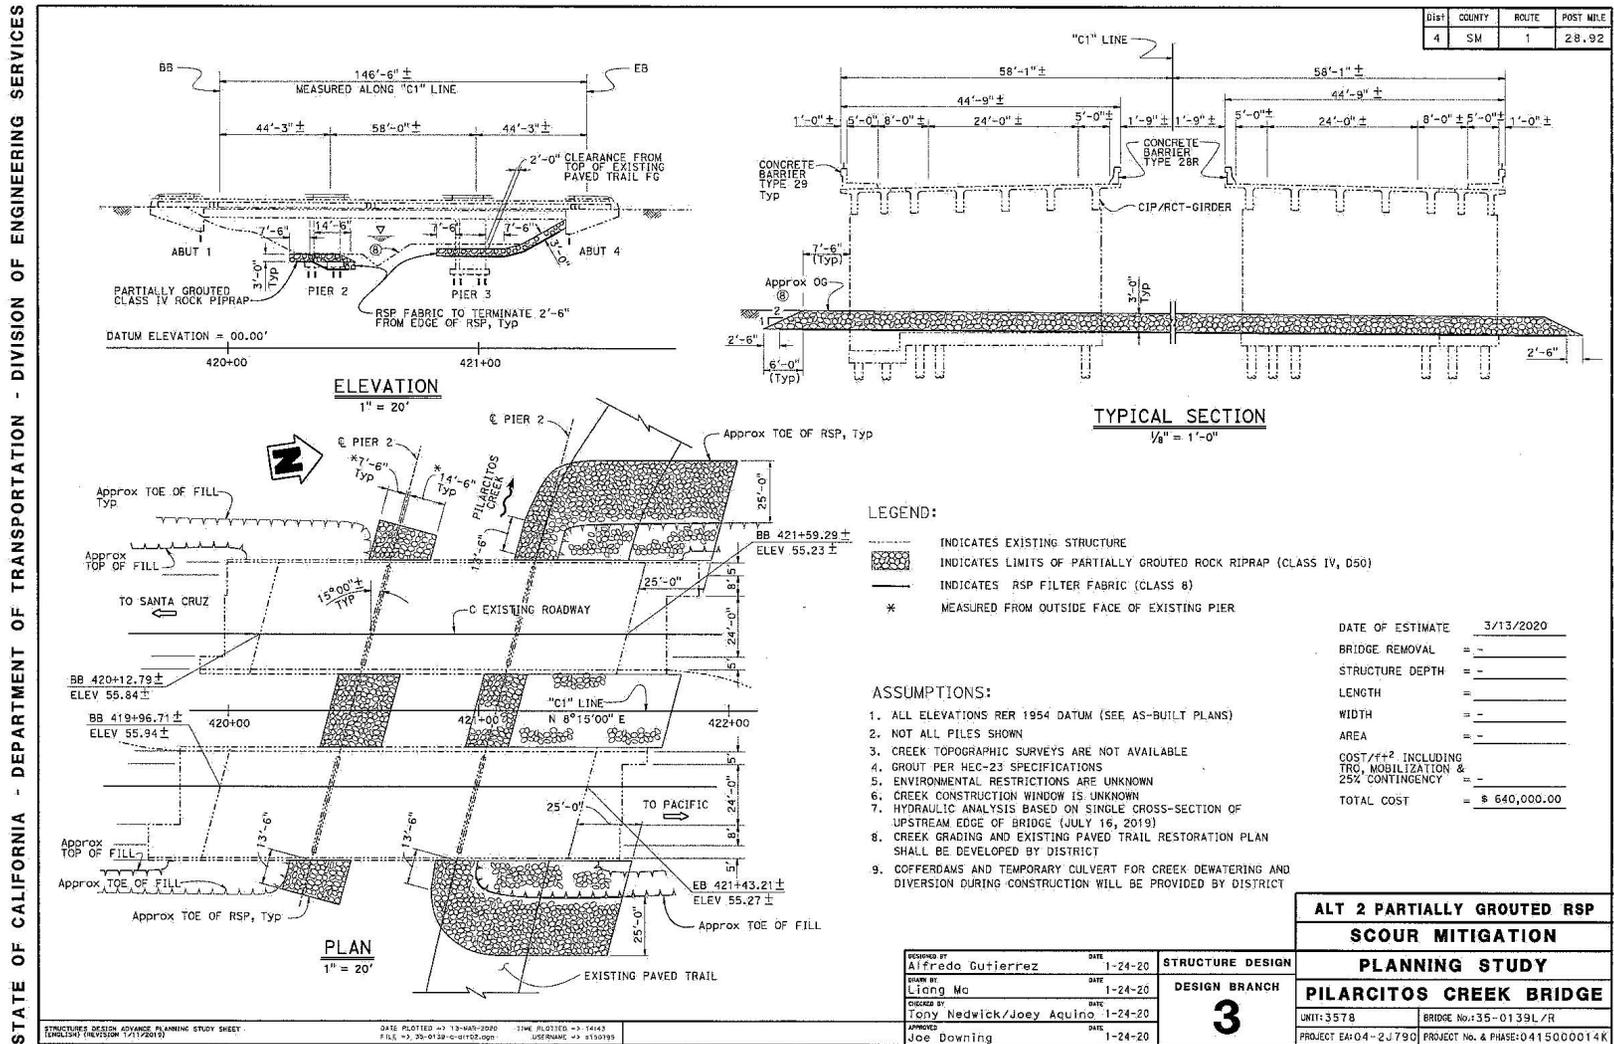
State Route 1 at Pilarcitos Creek Bridges Project Layout
